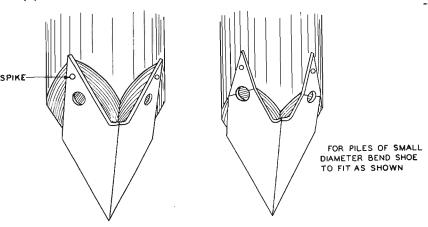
Steel pile shoe used to protect tips of timber piles in hard driving.
